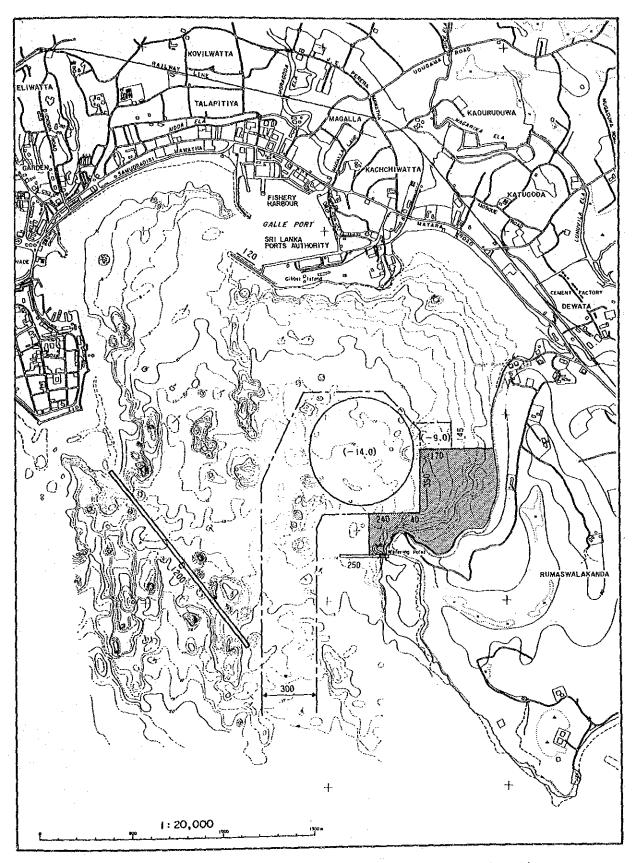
Short Term Development Plan (Alternative 1)
